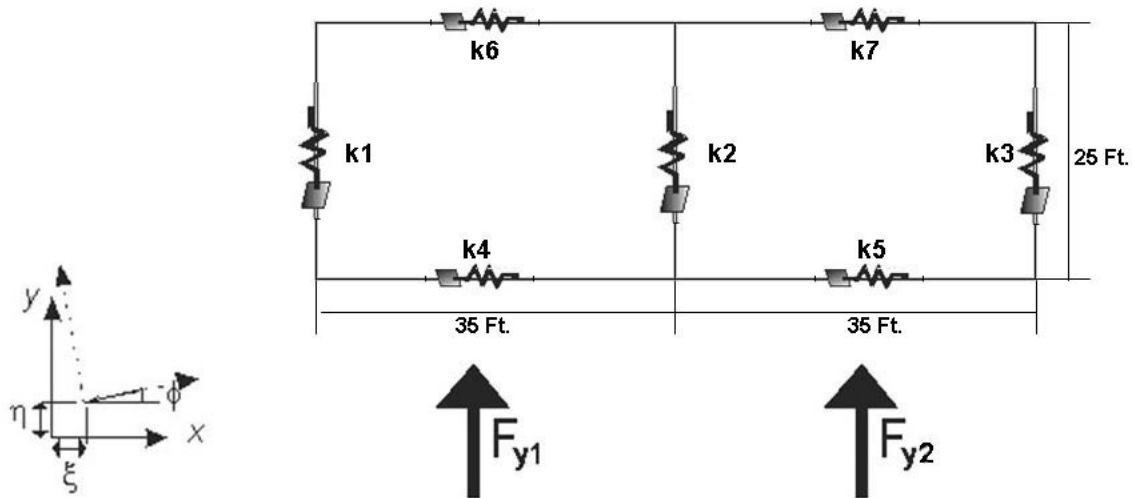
1: The “IRC House” geometry used to test the minimum requirements
